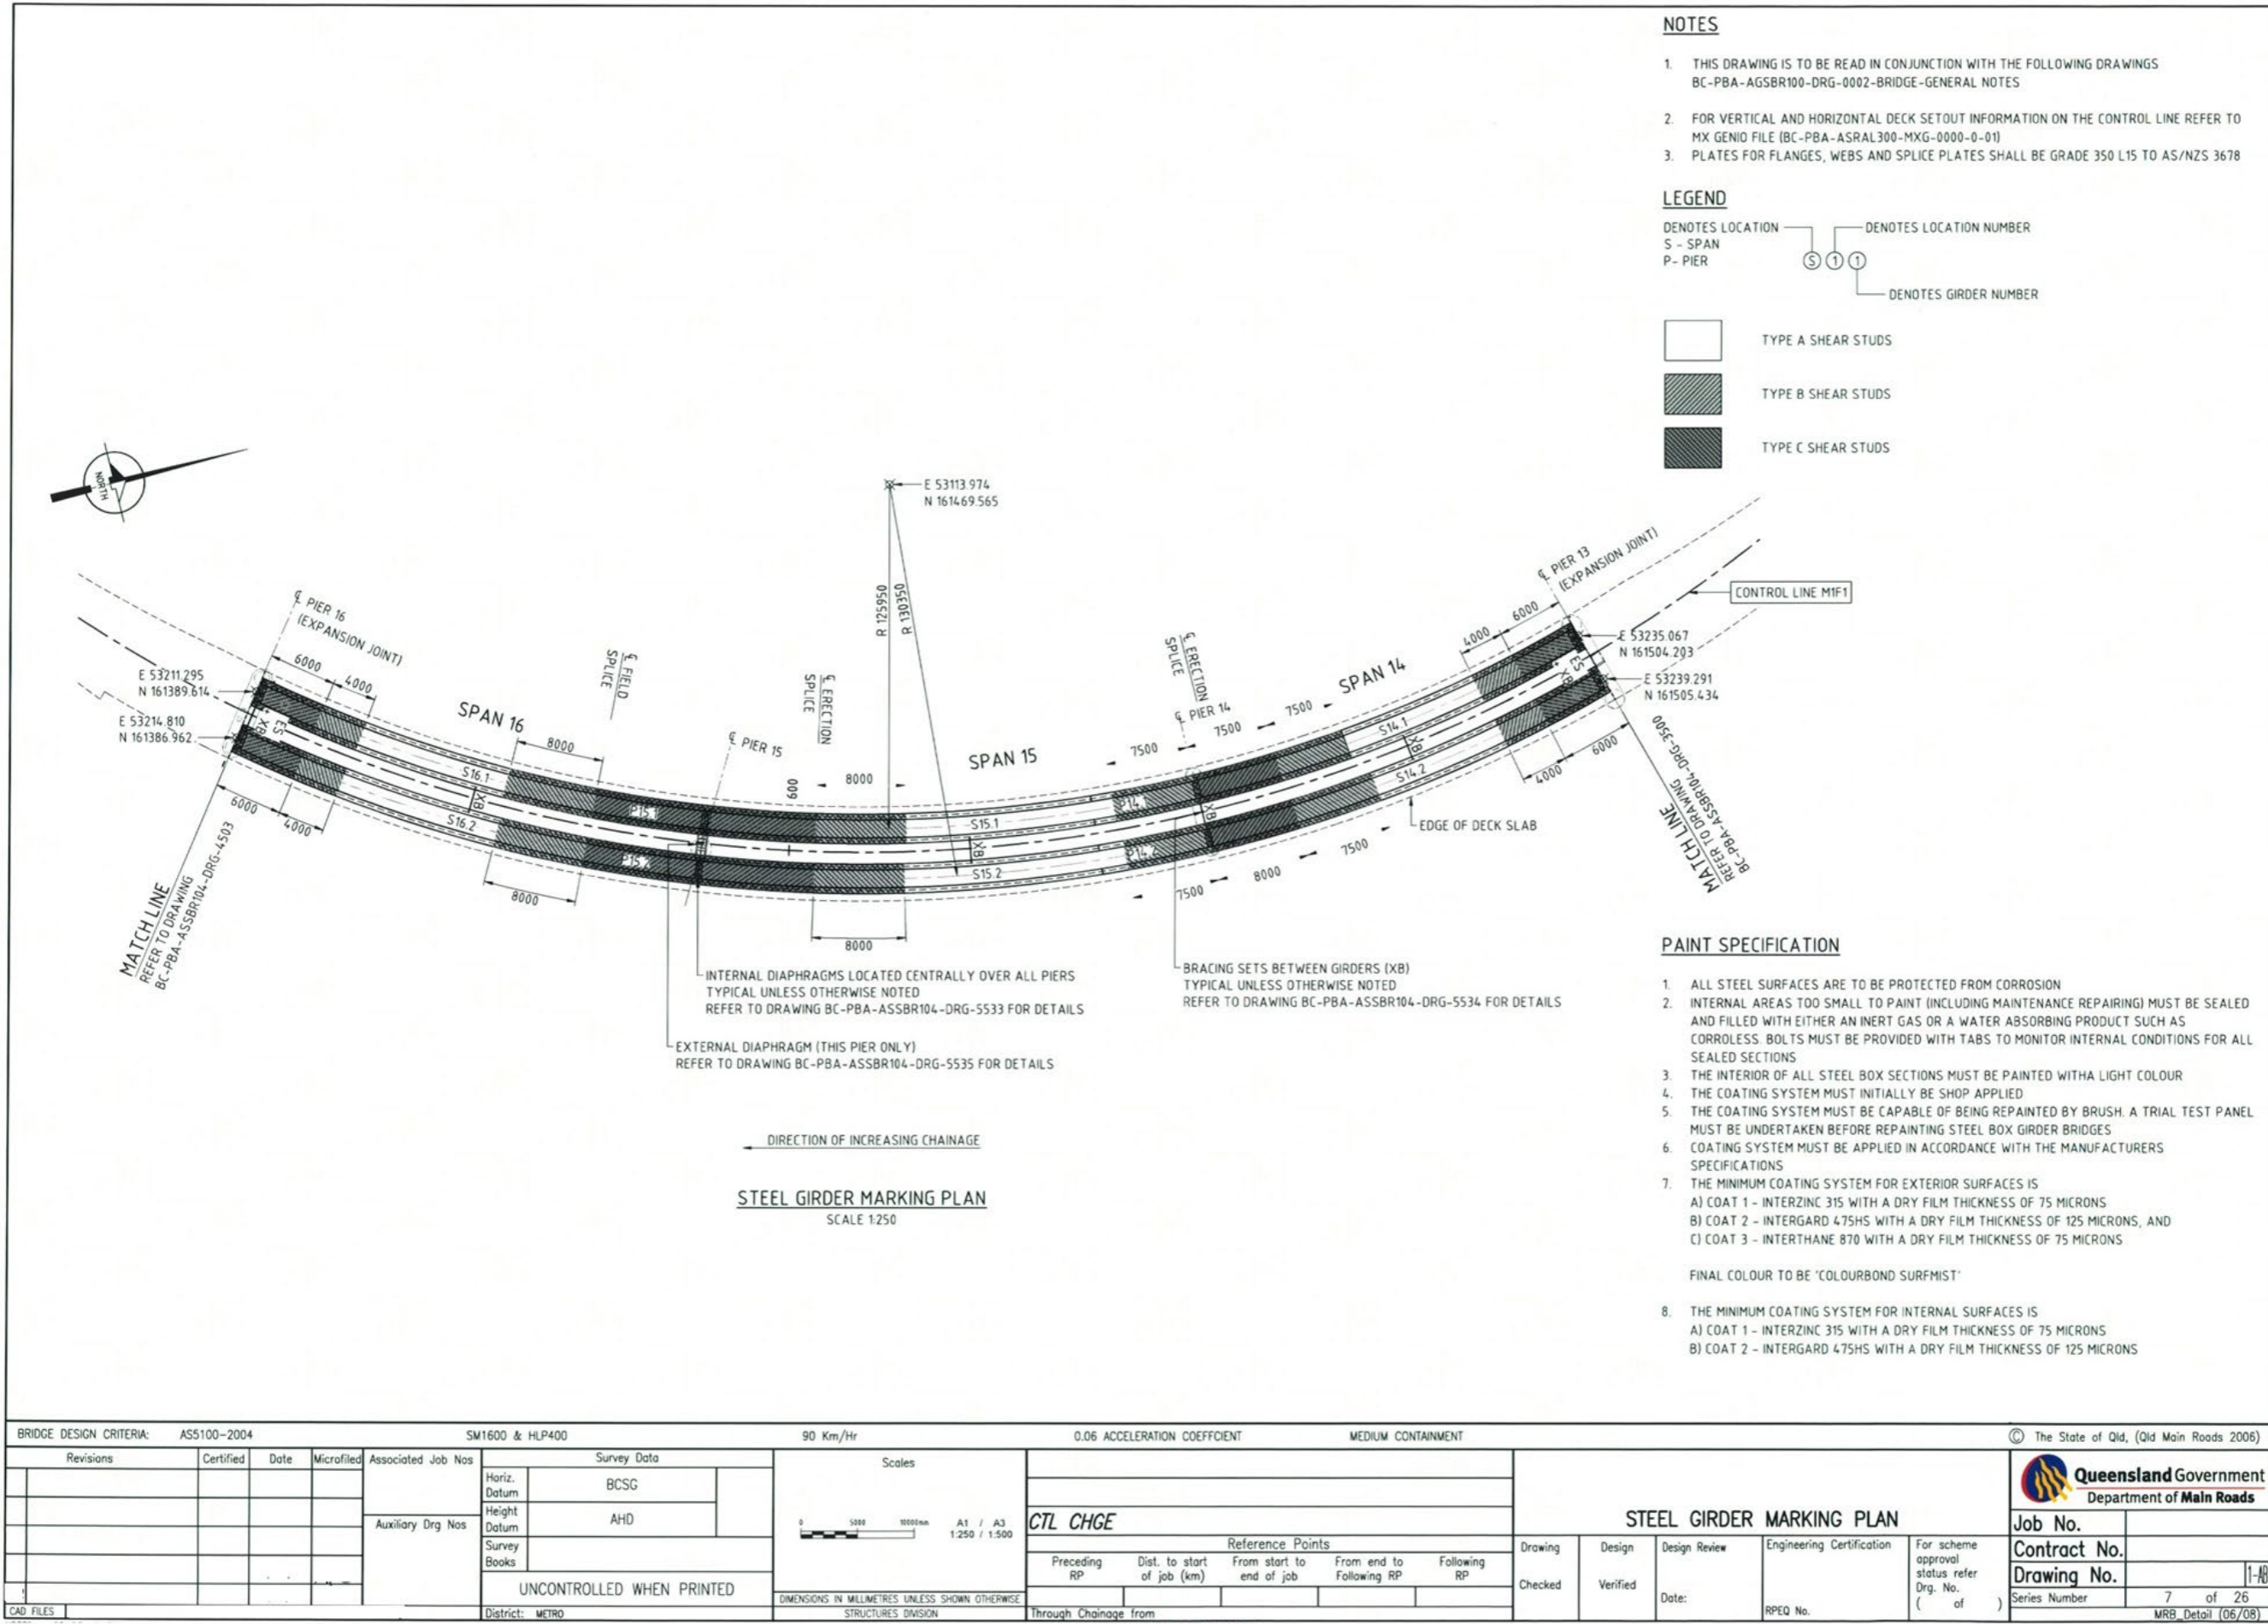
(b) - Example steel box girder bridge drawings - girder arrangement - Sheet 2
